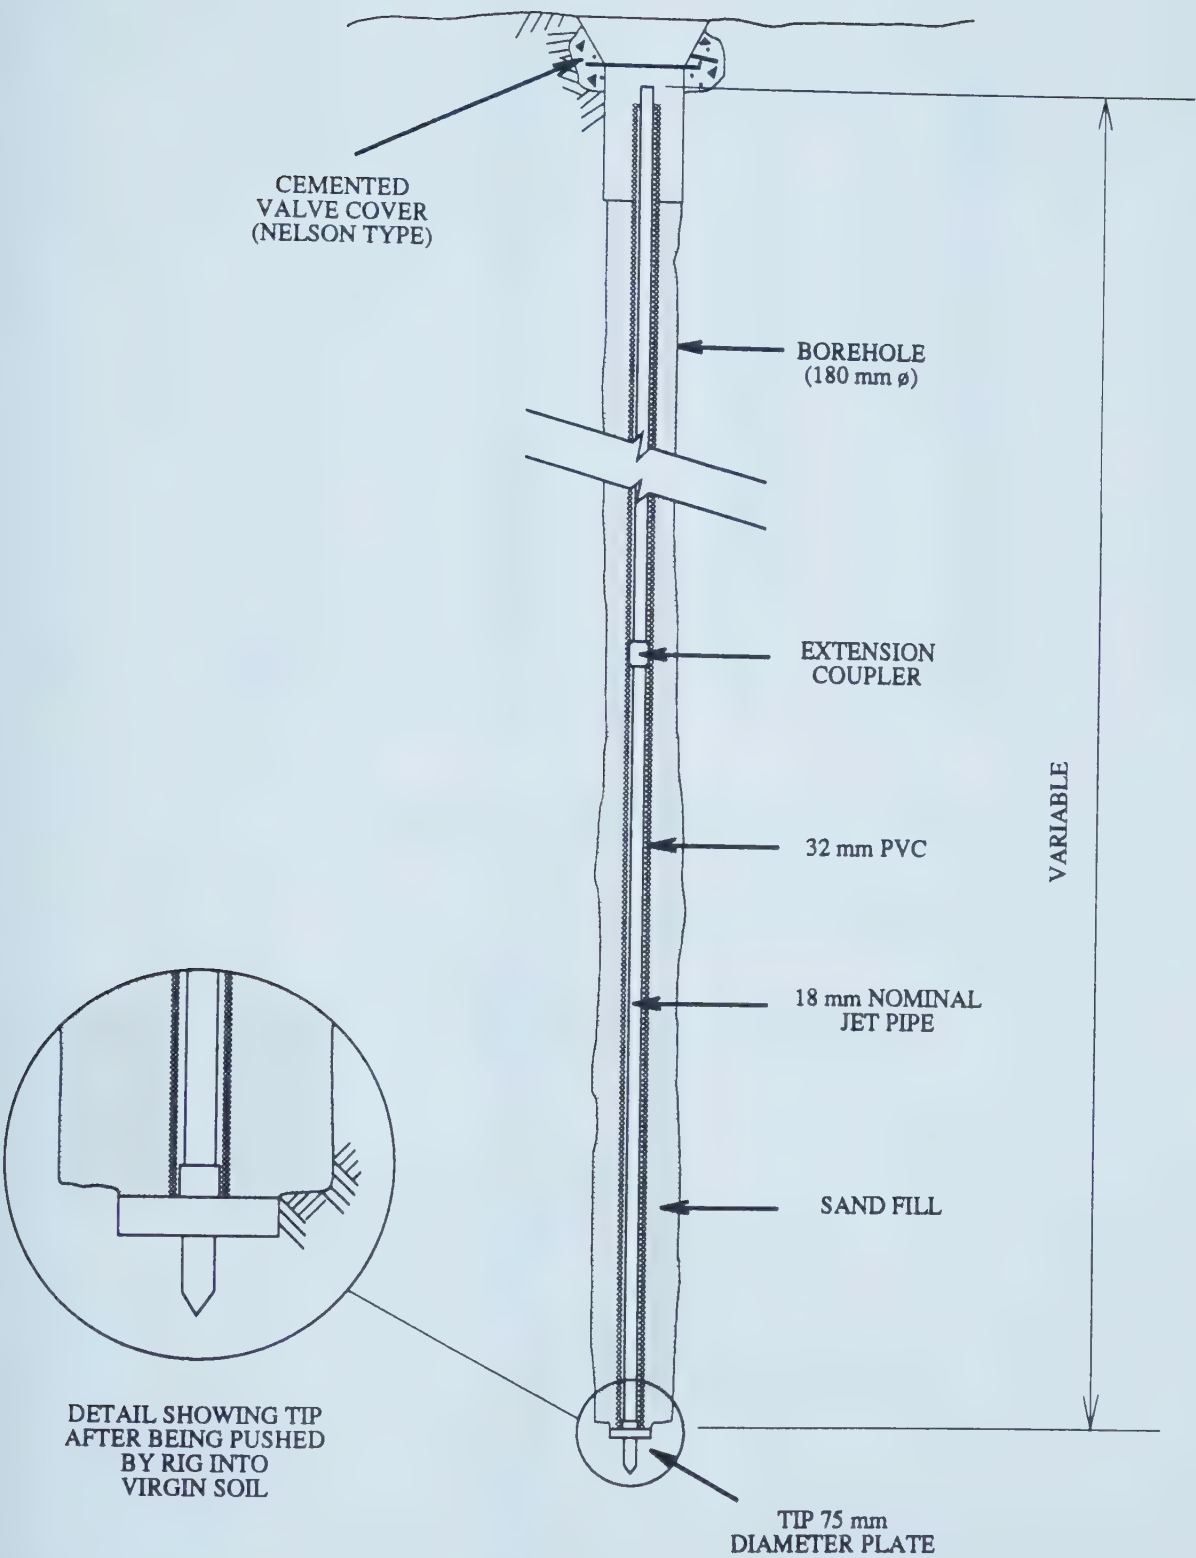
Installation Details for Deep Settlement Point and Bench Mark
